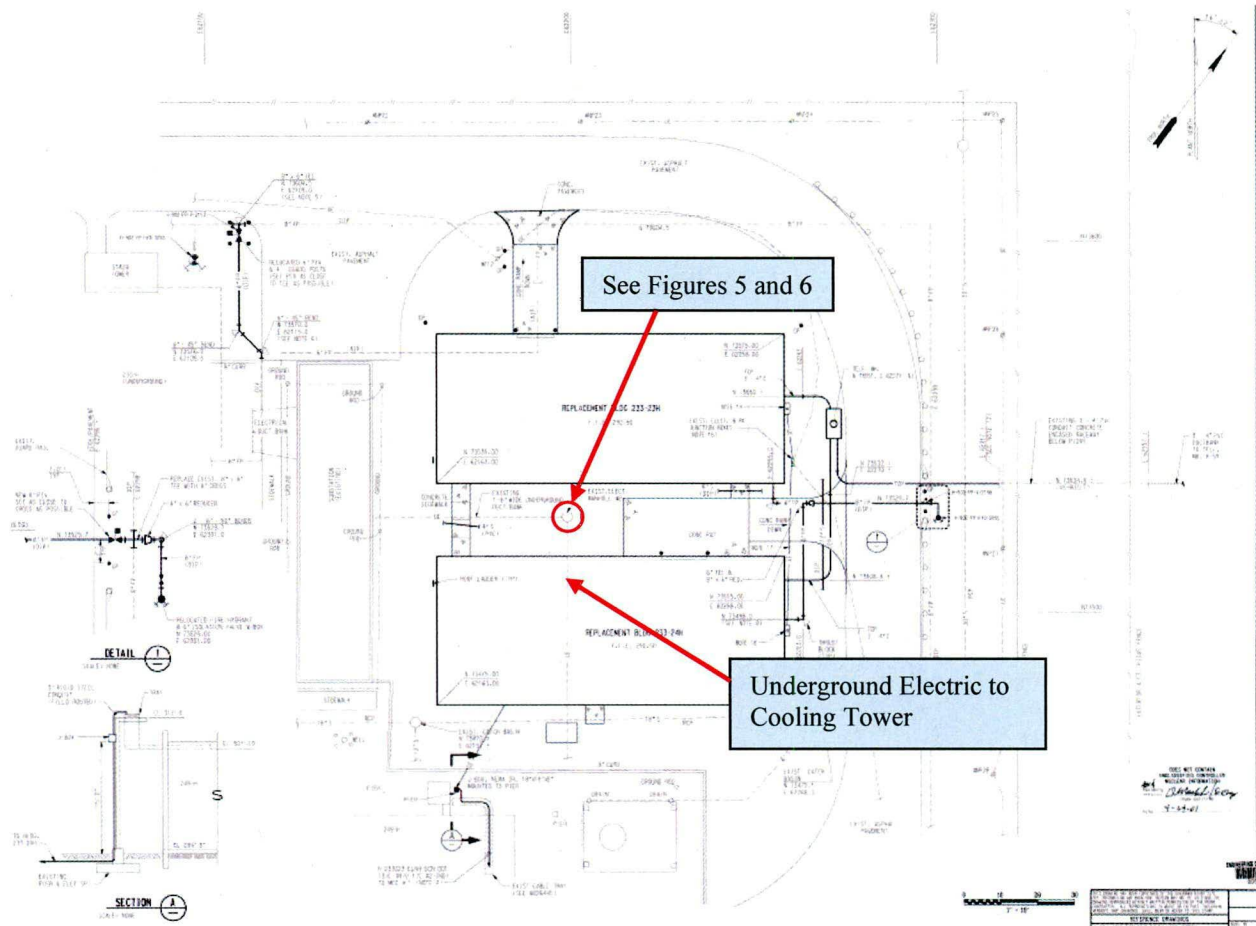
Building 233-23H and Building 233-24H Site Utility Plan
